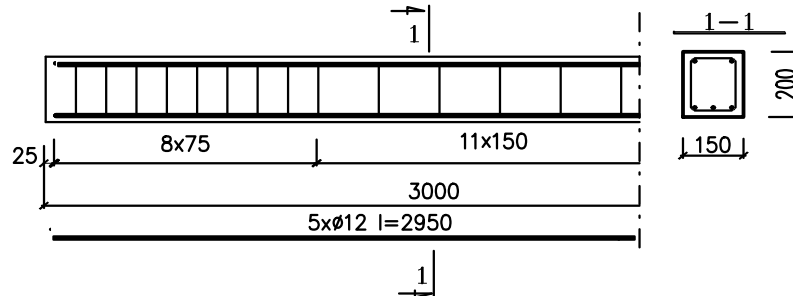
Dimensions and reinforcement of beams RB1÷RB15
